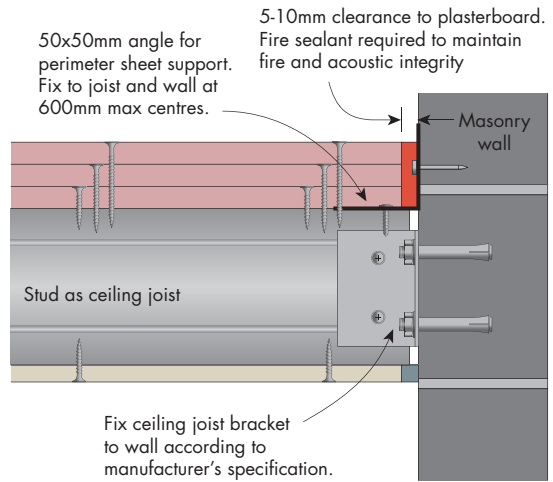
Fire Escape Tunnel Ceiling to Masonry Wall
